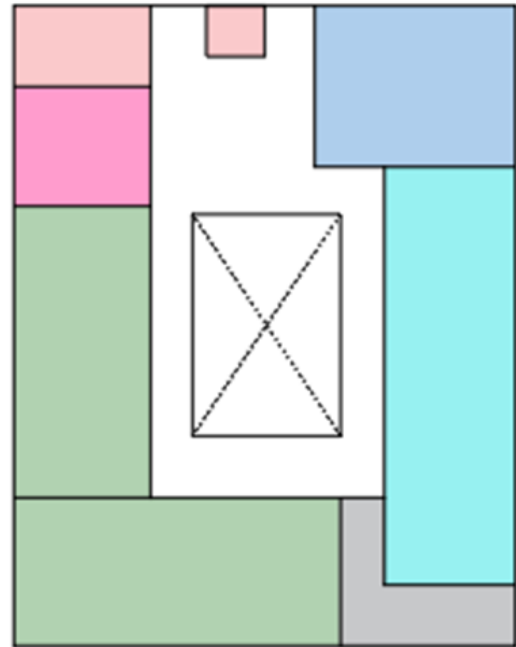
2<sup>nd</sup> floor and terrace floor plan
